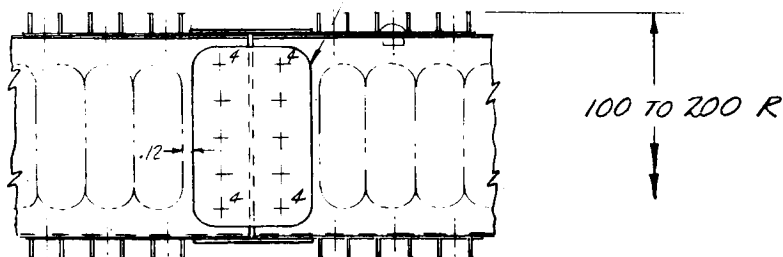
DETAIL OF COVER SPLICE CROSS SECTION - NO SCALE
